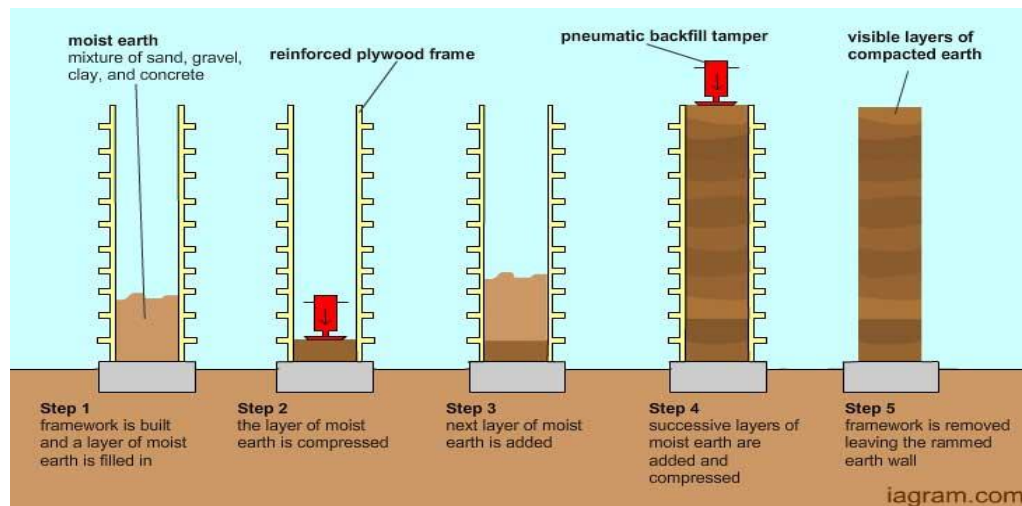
The Rammed Earth construction process, as described by Earth & Sun Construction (Gramlich, 2013)
